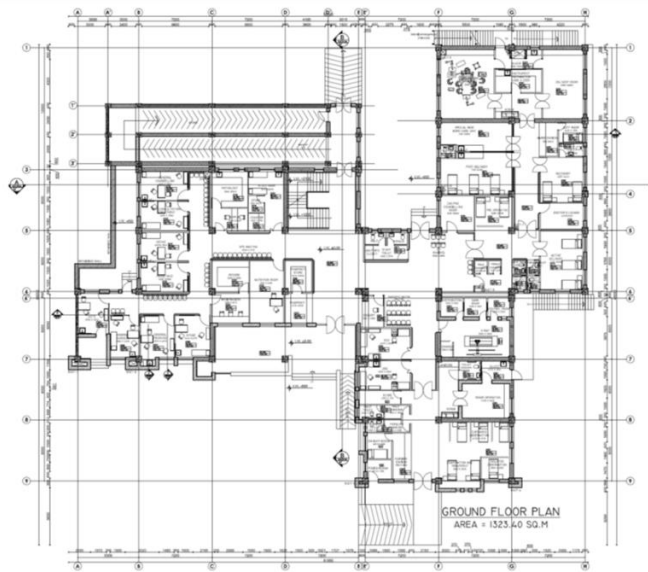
Layout plan (ground floor) of new hospital block, Mugu District Hospital
